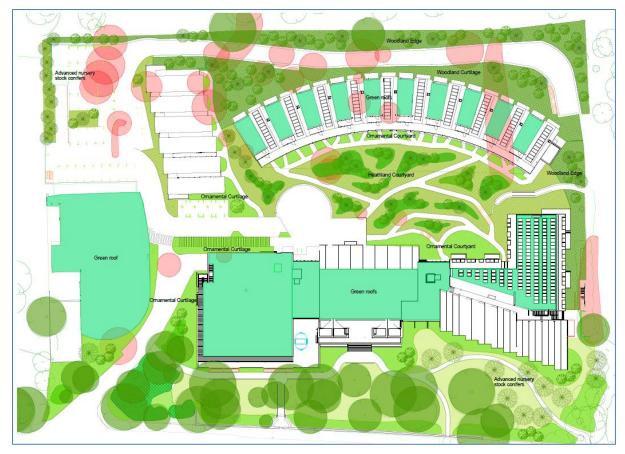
extract from the planting plan which may be found at Annex 5.3..
